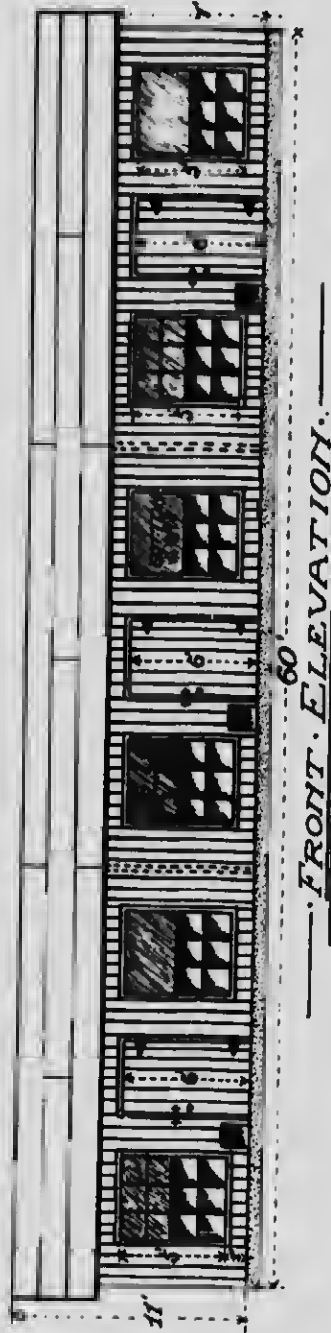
Showing front construction of continuous house. The plans given here are improved on the actual plans of house shown in Fig. 60. These plans call for more windows, giving more light and more air.
